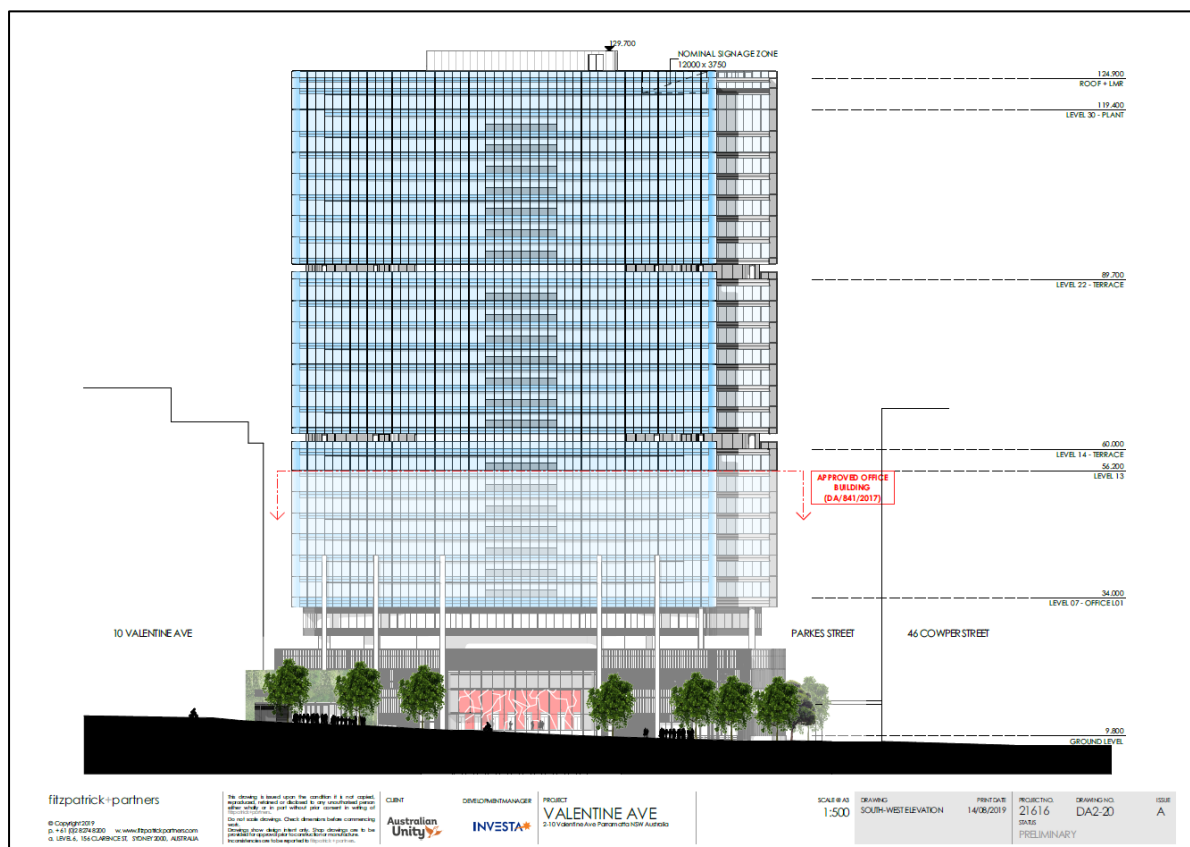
south-western elevation (showing portion of building approved under DA/841/2017 below dotted red line)
